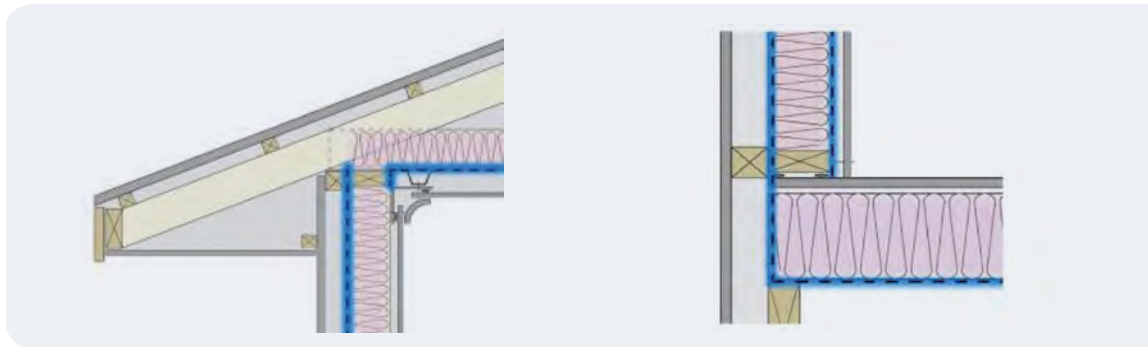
Seal ceilings to walls. Continuous seal created by fixing to wall plate.
